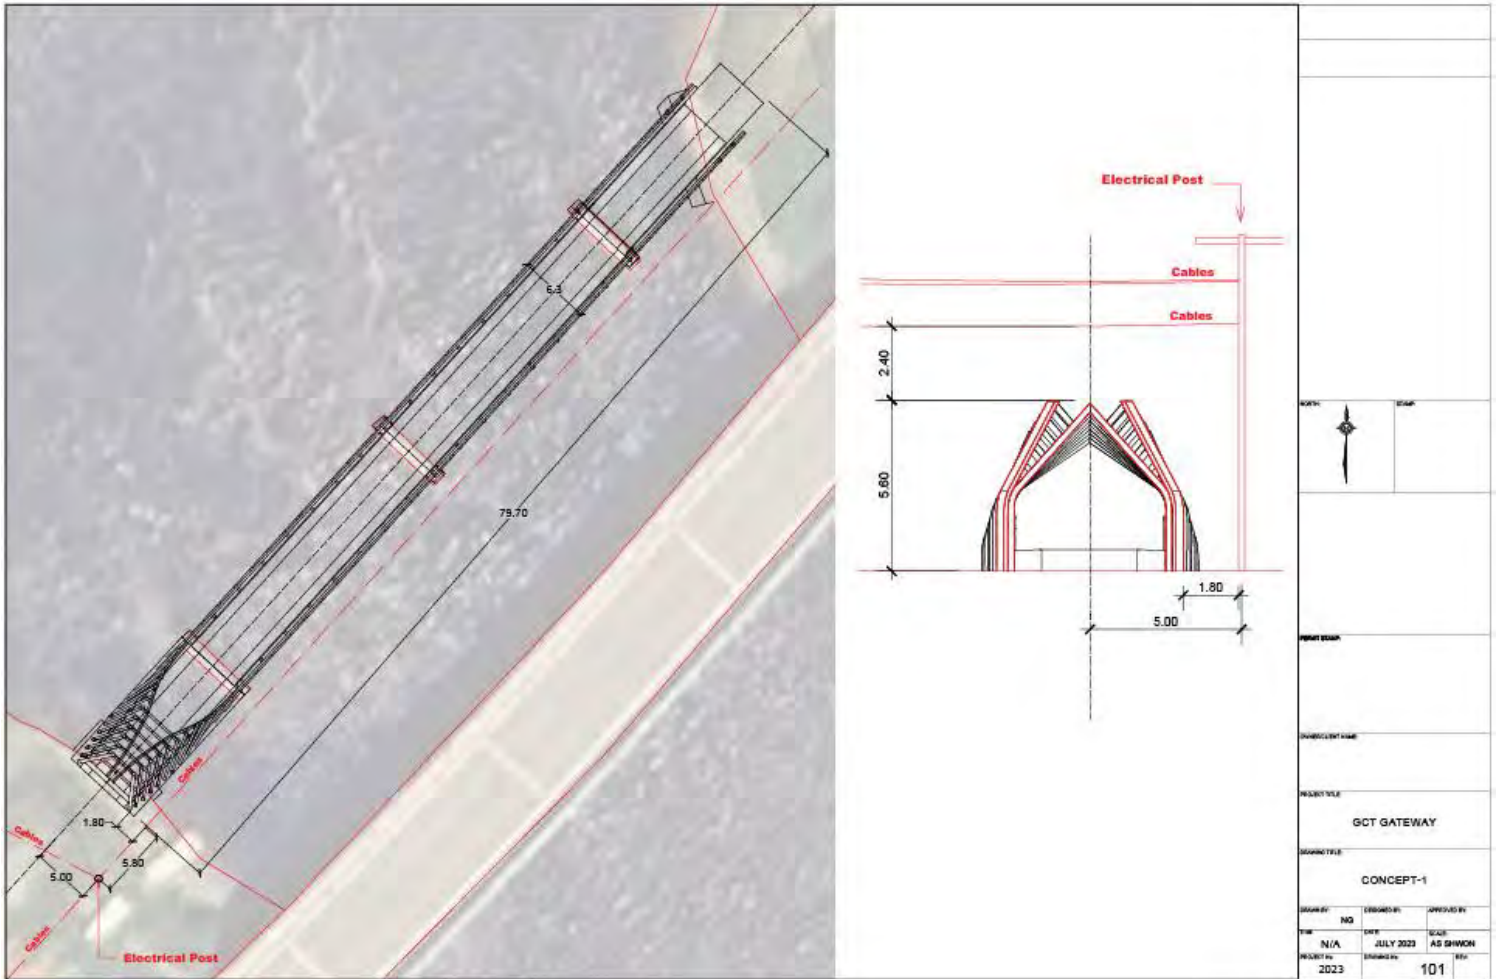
Proposed dimensions of the Parson's Pond Great Coastal Trail Gateway bridge
